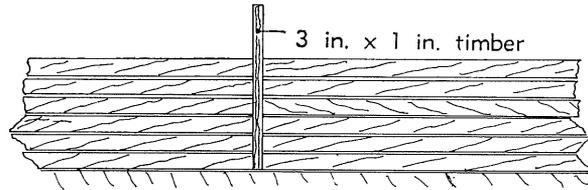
Struts assembled on a level surface and stacked one on the next.
